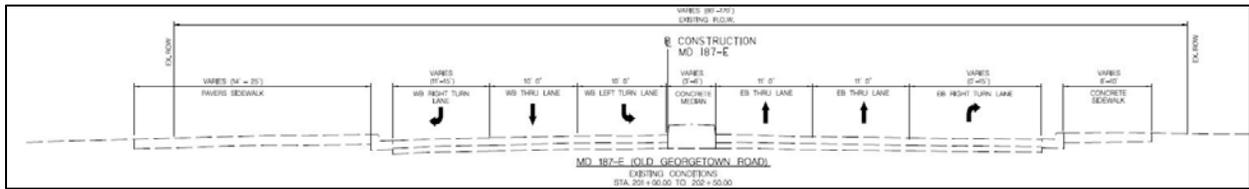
Existing Cross Section – Old Georgetown Road just east of Rockville Pike (Looking East)
